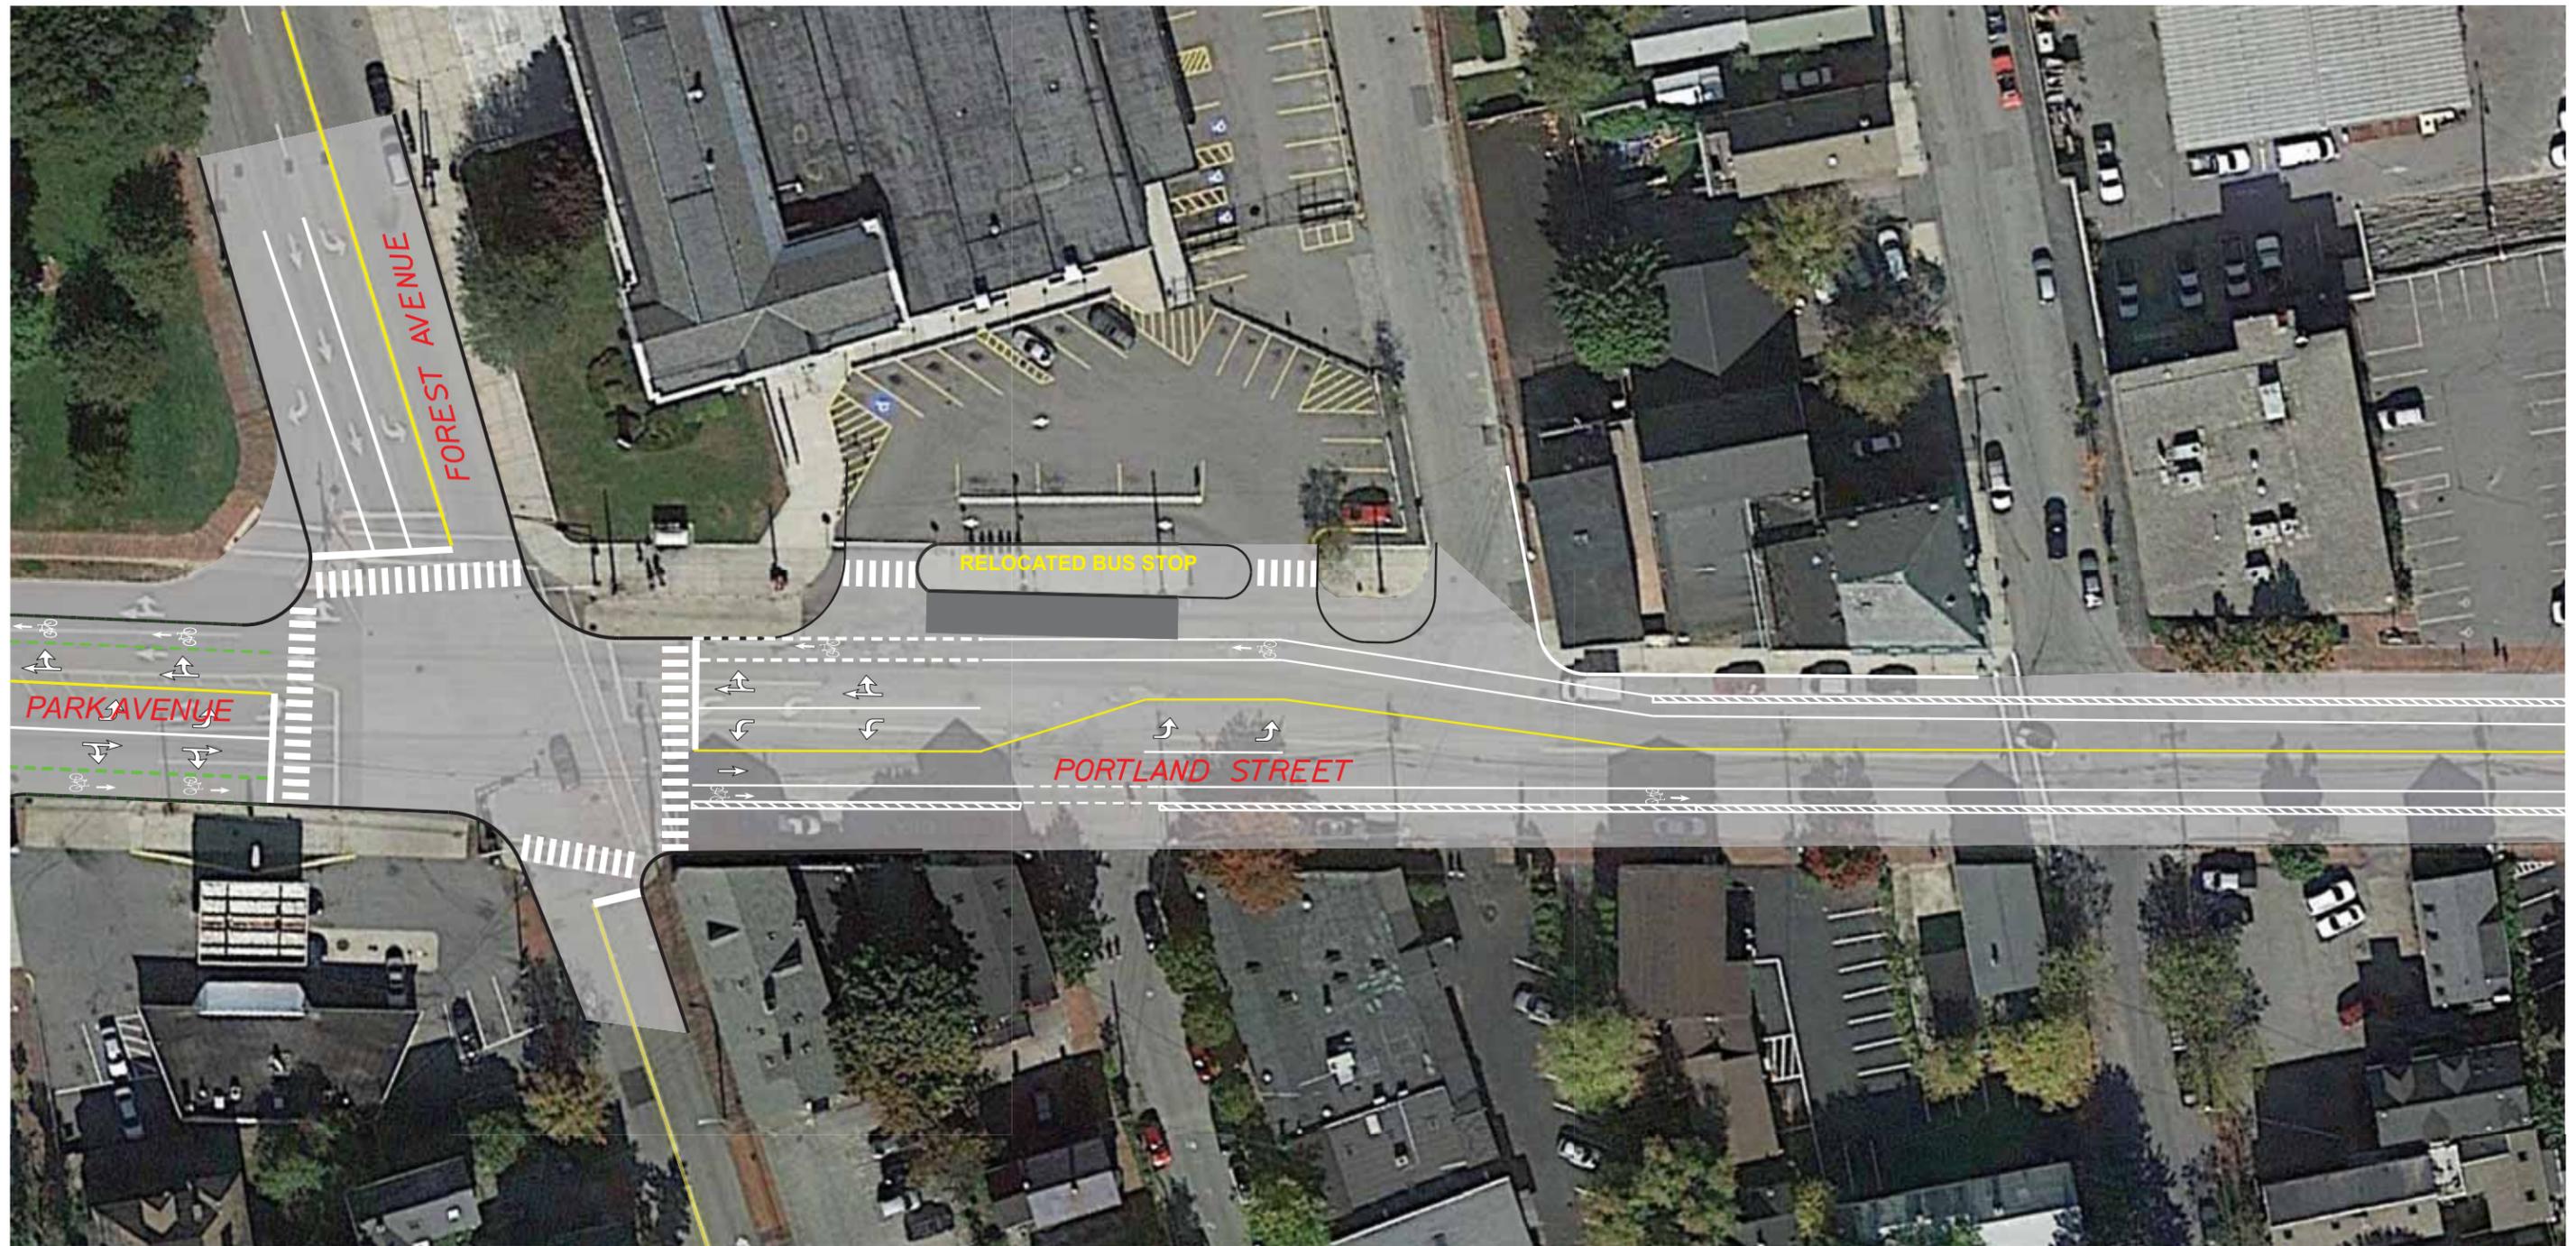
Portland Street/Forest Avenue/Park Avenue Modification
